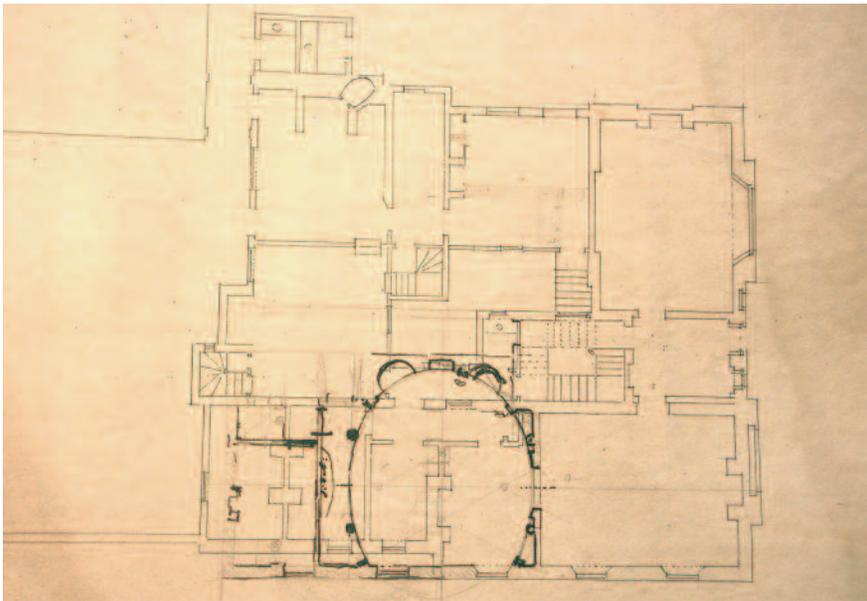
John Soane, Moggerhanger House, ground floor plan, sketch with oval breakfast room proposal, 1797. North is at the top. *Sir John Soane's Museum*, 3/3/10v.
